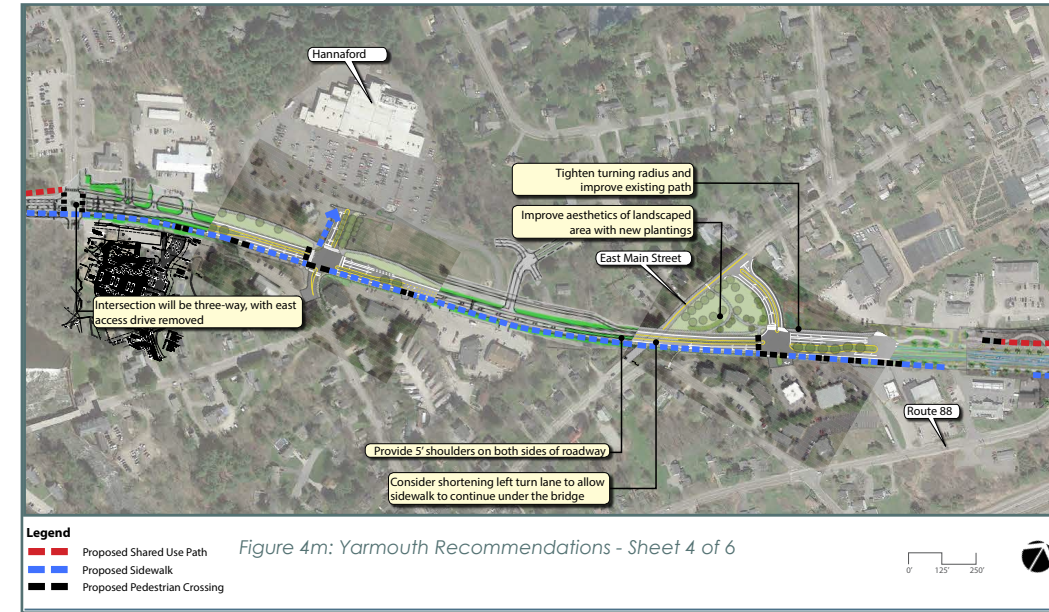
Yarmouth Recommendations - Sheet 4 of 6
